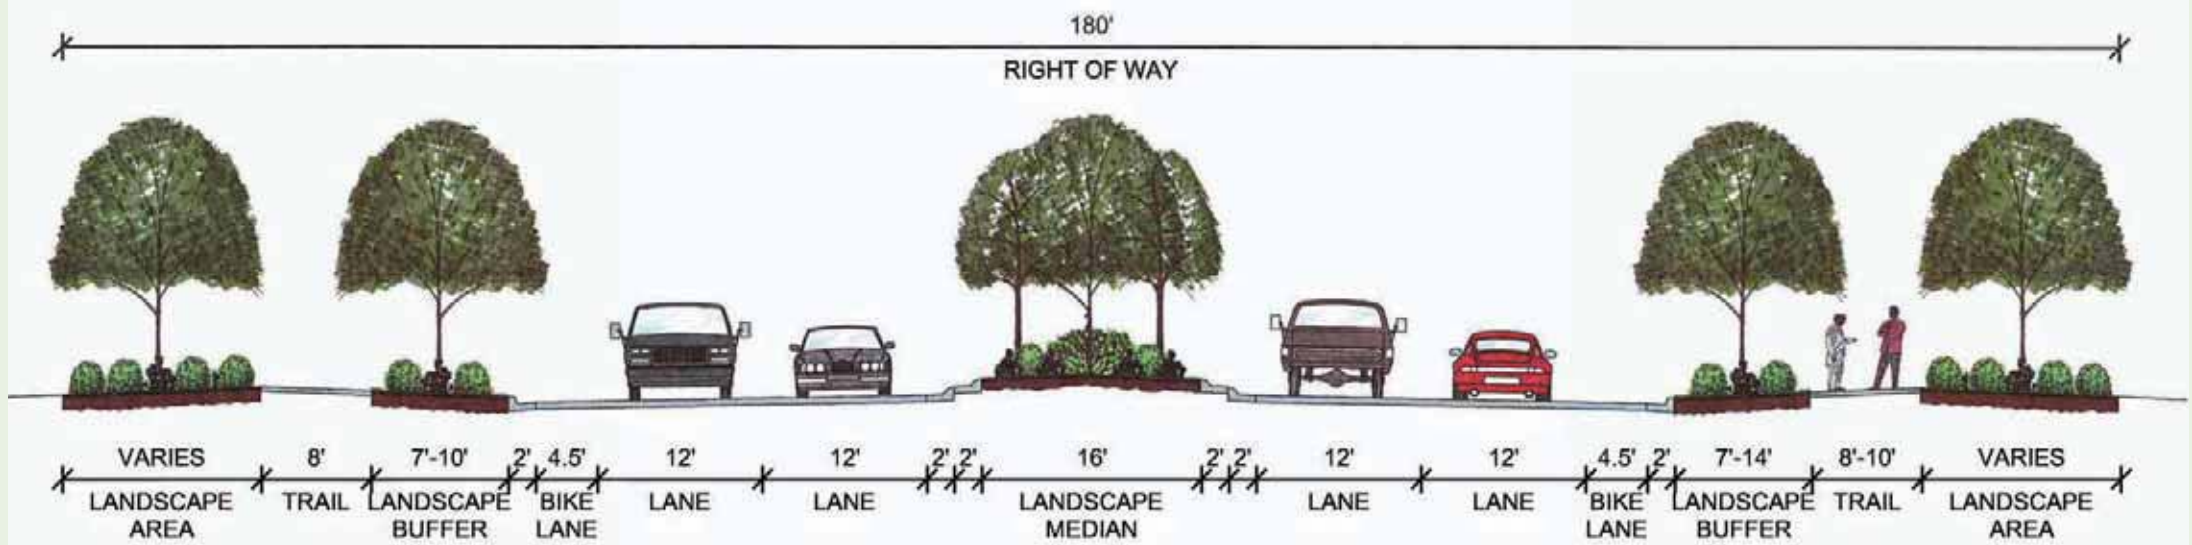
Conceptual 4-lane Cross Section Of 48th Avenue
